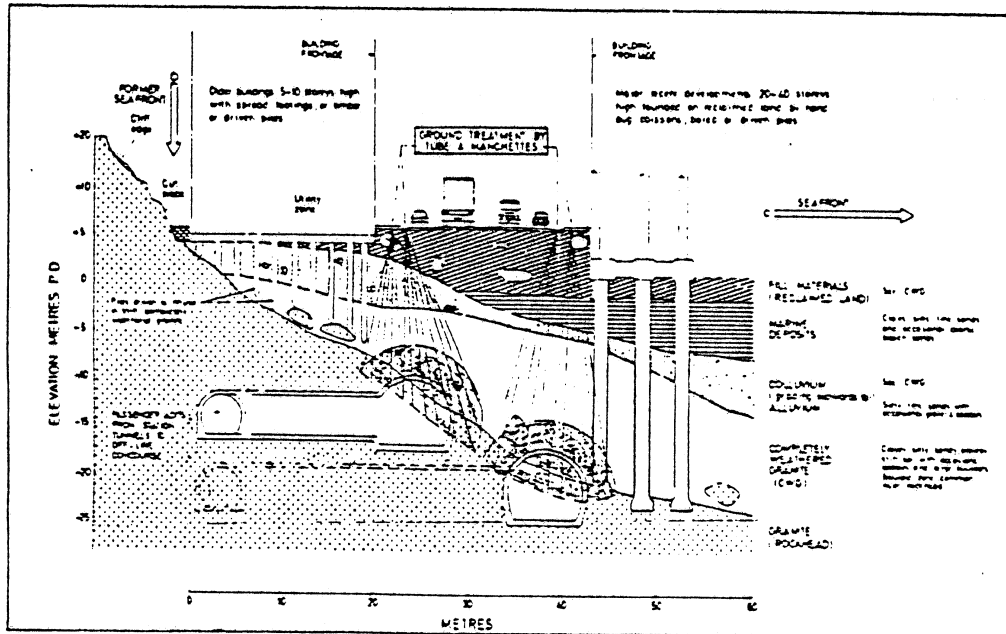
Typical Cross Section Showing Treatment of "Soft Ground" Sections of Rock Tunnels, Hong Kong (McFeat-Smith et al., 1985).
